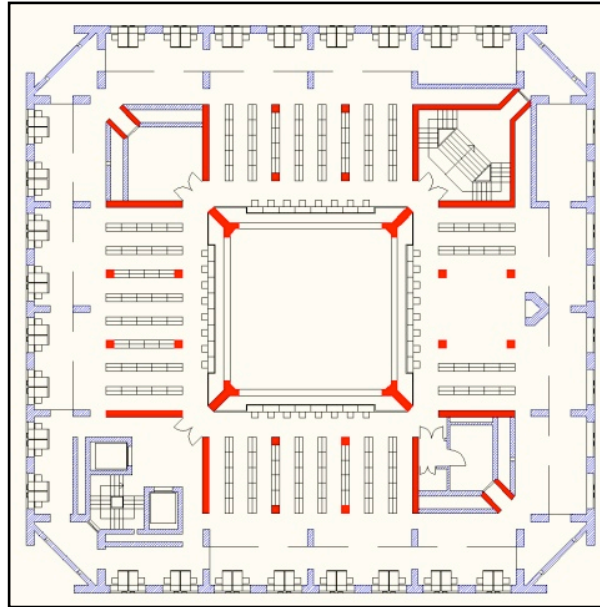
Blue hatch showing brick and red showing concrete structure (Re-Drawn by Author)
